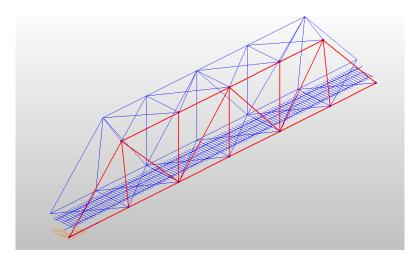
Isometric View of Midas 3D Through Truss (Span 4) (Near truss highlighted for clarity)
